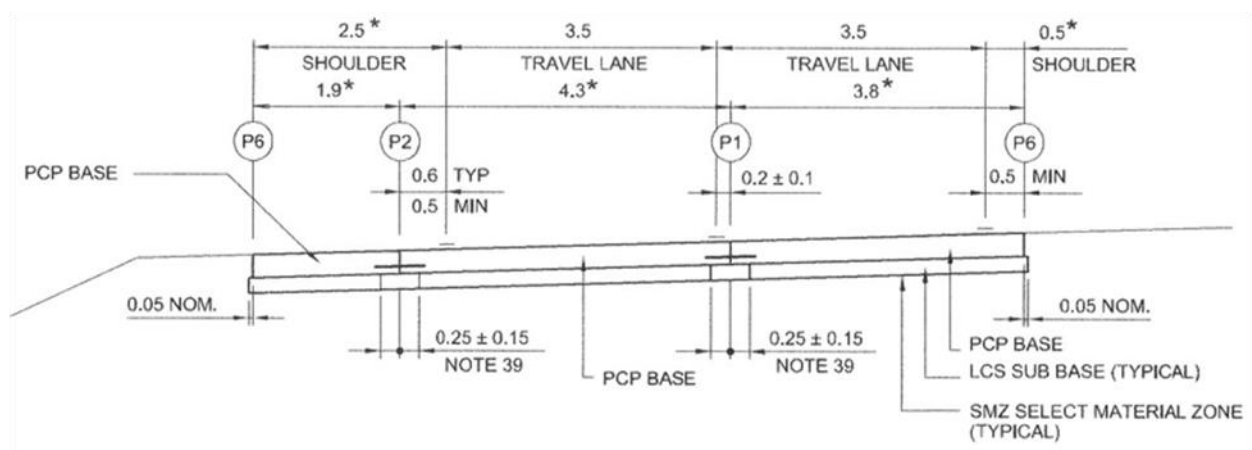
Locations of longitudinal joints in partial width LMC paving to avoid reflection cracking shown
